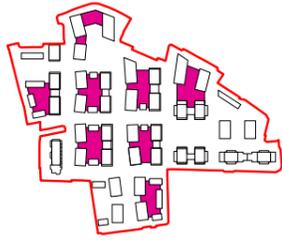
Coding plan - Typical Podium Garden with townhouses
